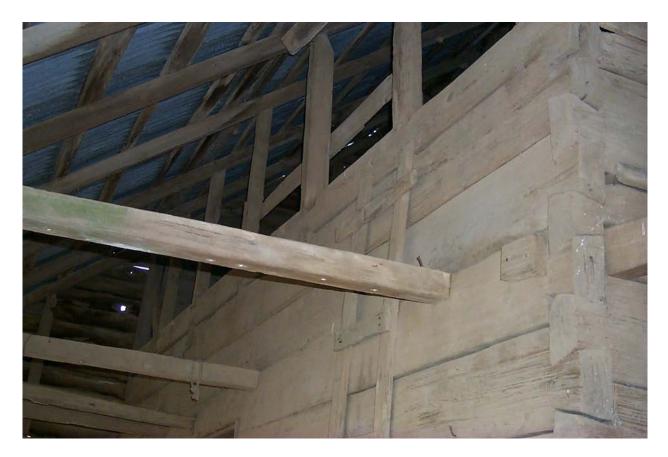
This ladder, on the western wall of Room 1, once led to a loft door.
